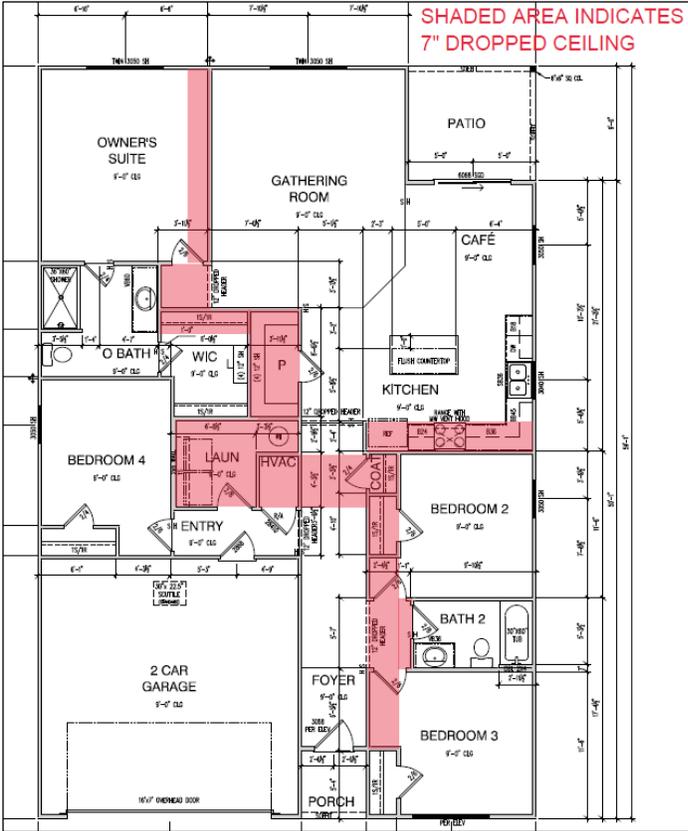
Example showing dropped ceiling in low-visibility areas to limit impact on interior space and to minimize poor aesthetics.
